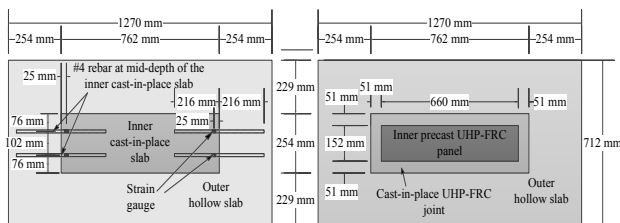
Specimen details for punch test specimen (a) Specimen with No. 4 rebars and cast-in-place PC (b) Specimen with an inner precast UHP-FRC panel and a cast-in-place UHP-FRC joint.
